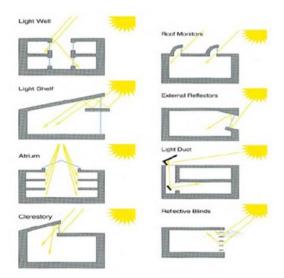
Different styles of windows and overhands to control light inside buildings, Source: [69]
